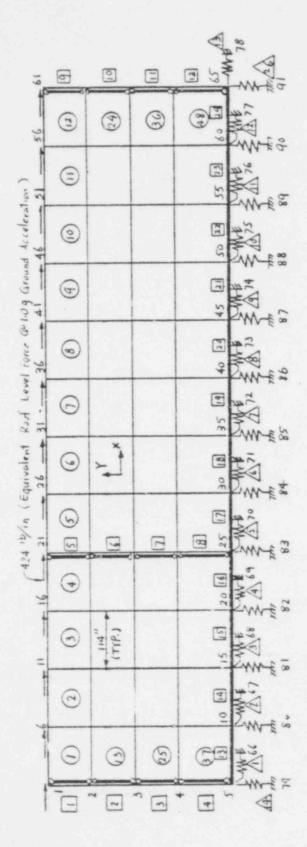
FINITE ELEMENT MODEL OF WEST WALL
